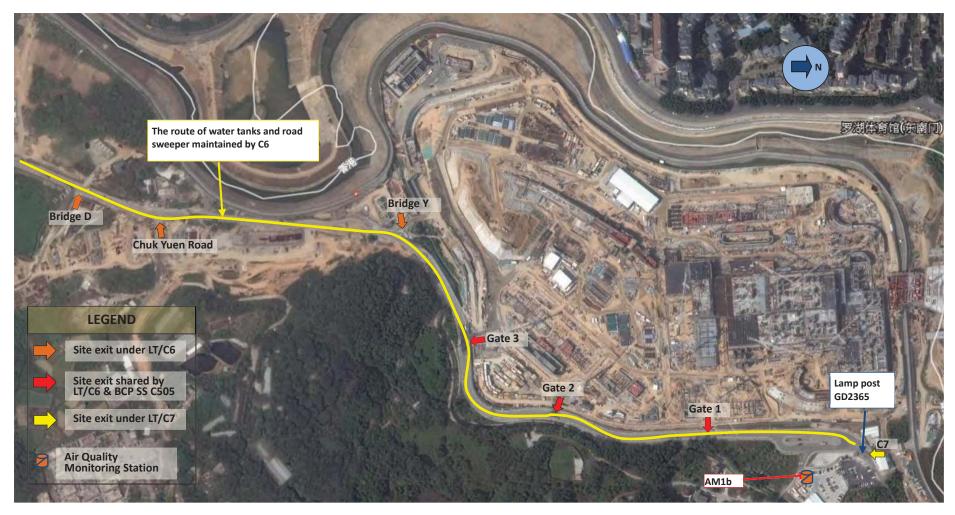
Location Plan for Site exits along Lin Ma Hang Road
